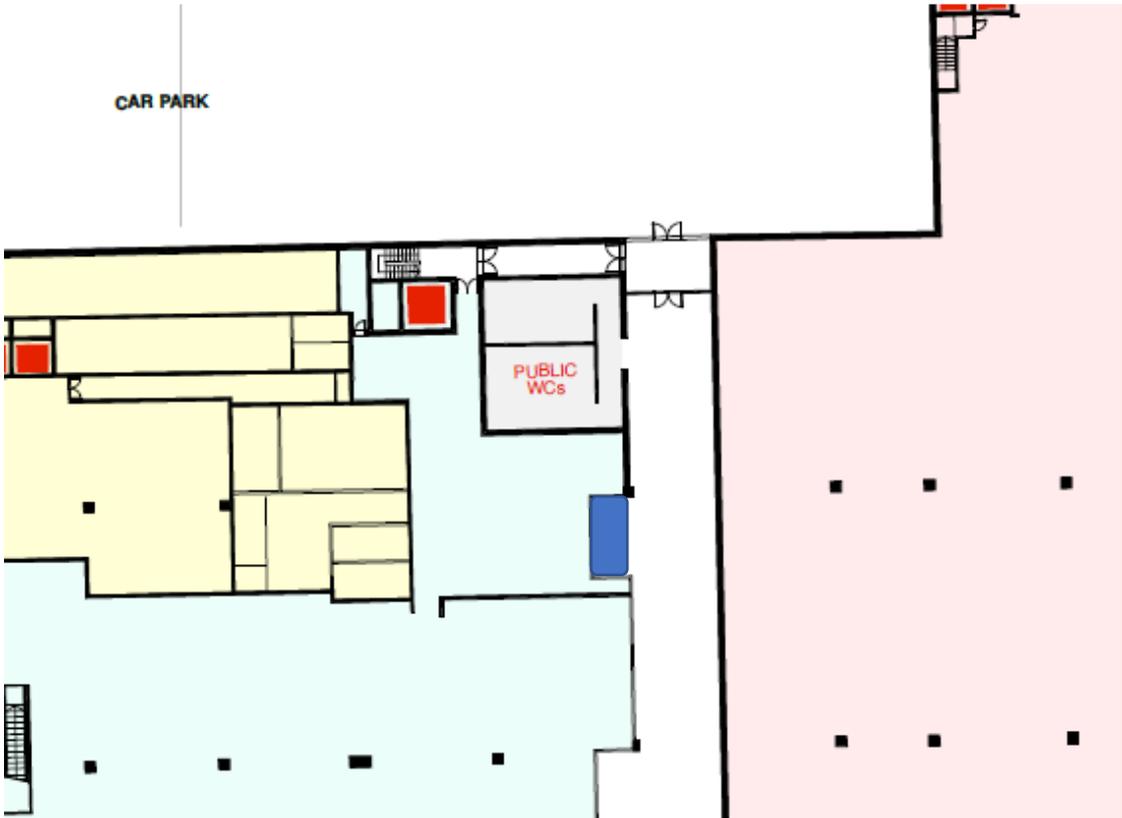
Proposed Changing Places facility within 1st Floor of Rugby Central.
